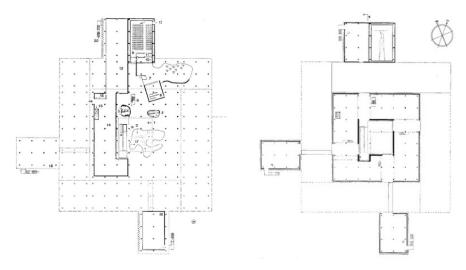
Floor plans of Sanskar Kendra, Ahmedabad. (L) Ground floor plan, (R) First Floor Plan. Source: https://www.inexhibit.com/mymuseum/sanskar-kendra-city-museum-ahmedabad-le-corbusier/
